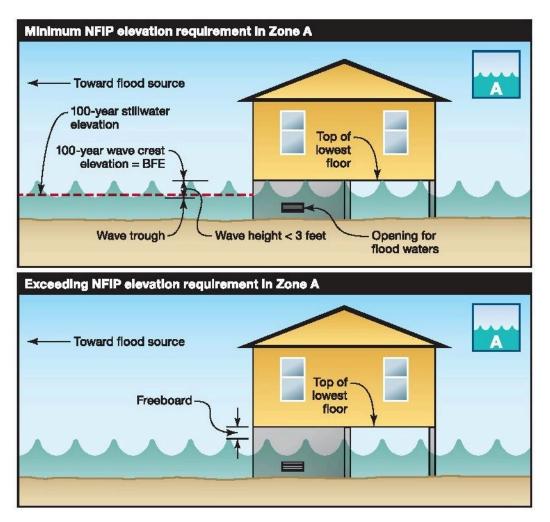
Recommended Elevation for Buildings in Zone A Compared to Minimum Requirements Source: FEMA Coastal Construction Manual, 2011
